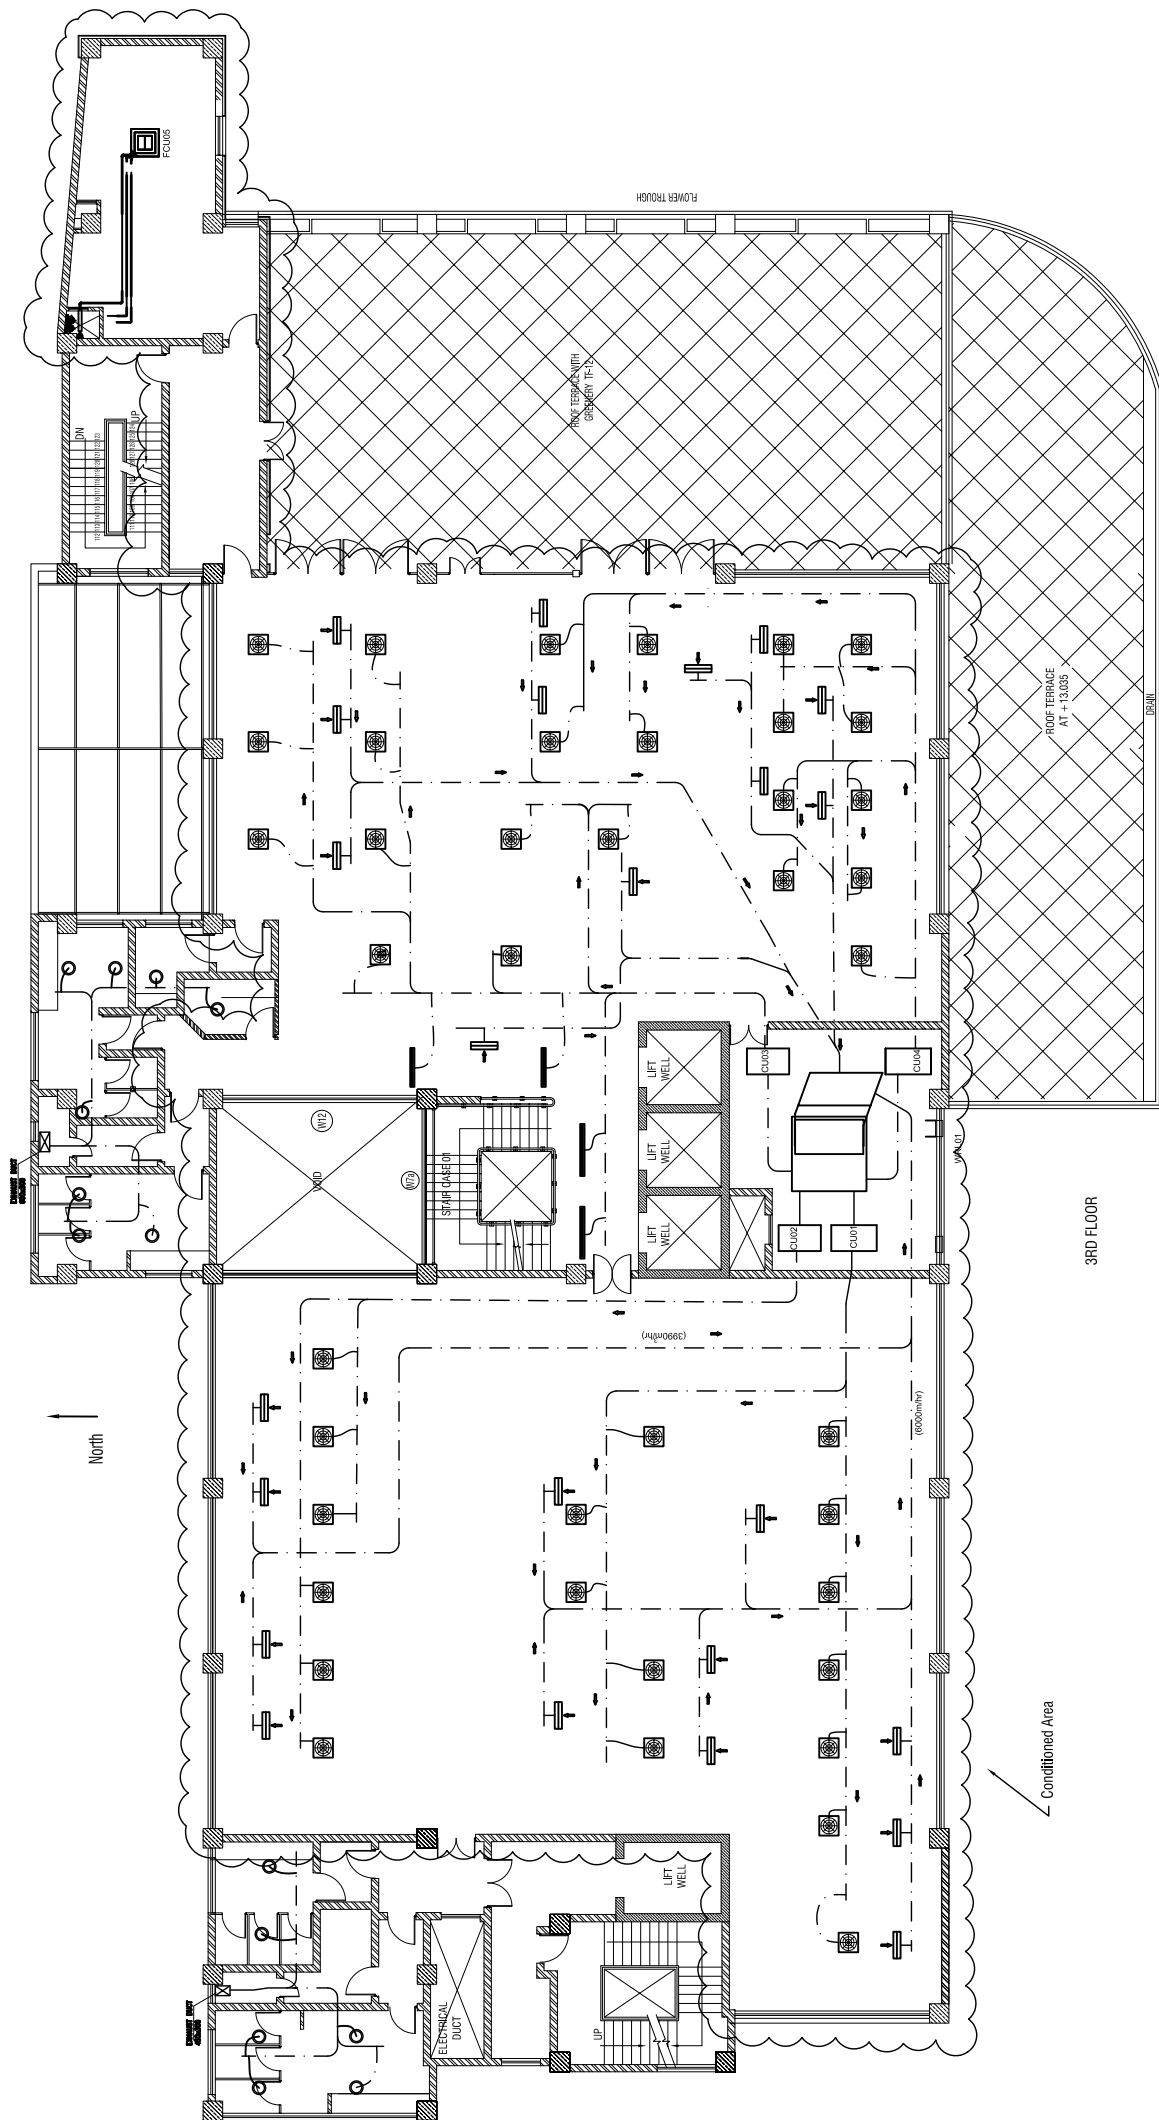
Ceylon Petroleum Corporation Head Office Building - 2 to 6 Typical Floor
